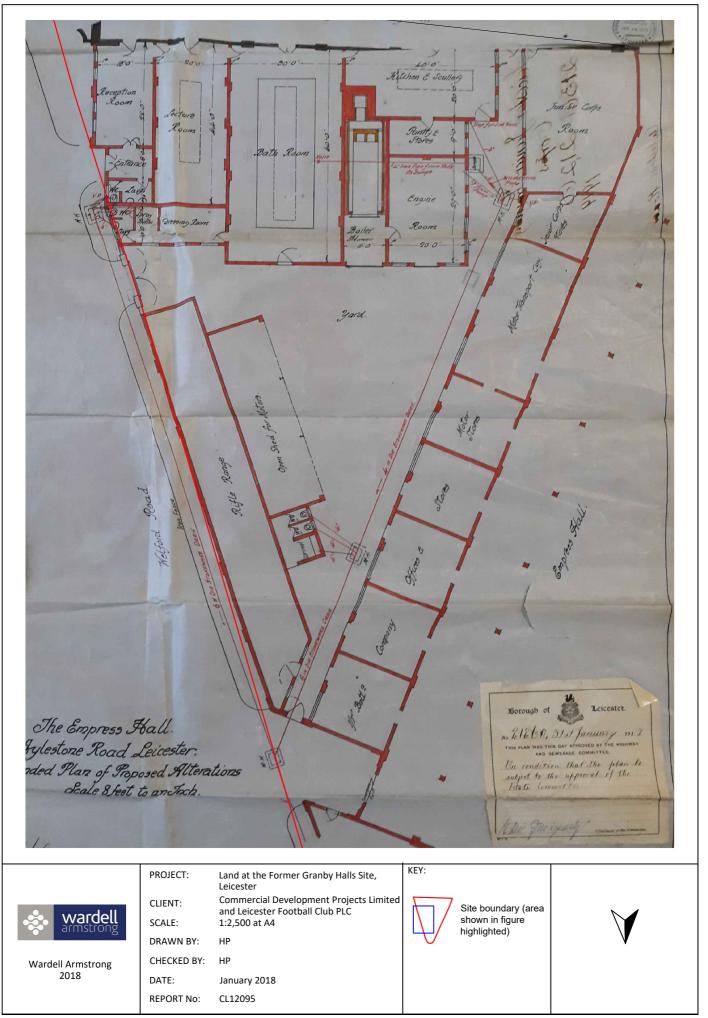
Plan of Proposed Amendments to Empress Hall, 1919.
